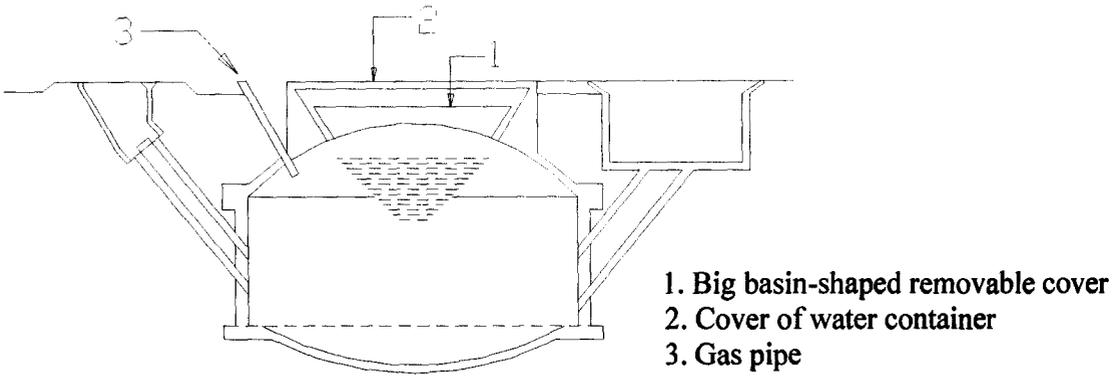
Hydraulic Biogas Digester with a Big Basin-Shaped Removable Cover
